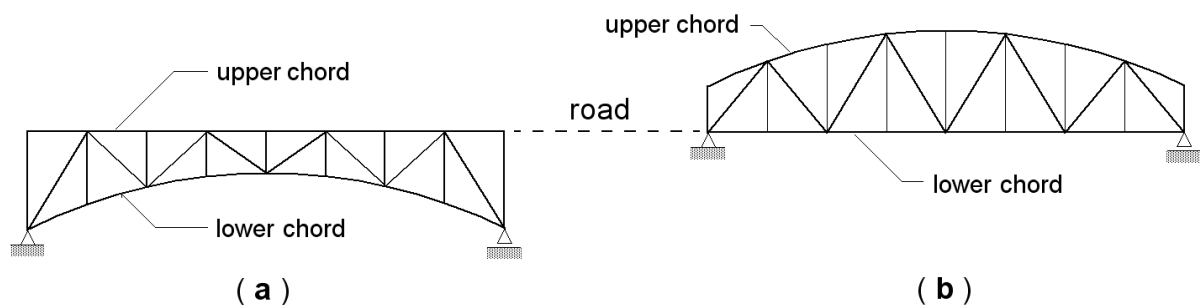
Examples of trusses for road bridges, a) below the deck and b) above the deck
